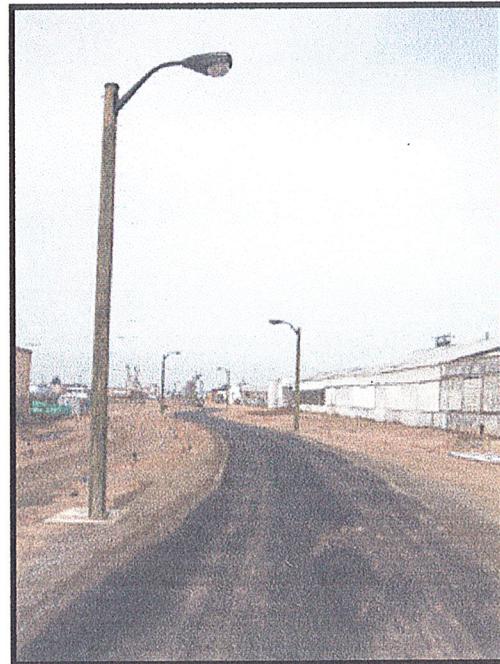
Newly installed section of parkway, north of Dinuba Avenue.
